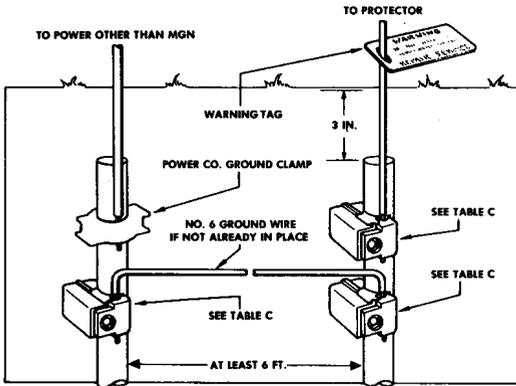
Power Other than MGN Grounded to Ground Rod—No Water Pipe
